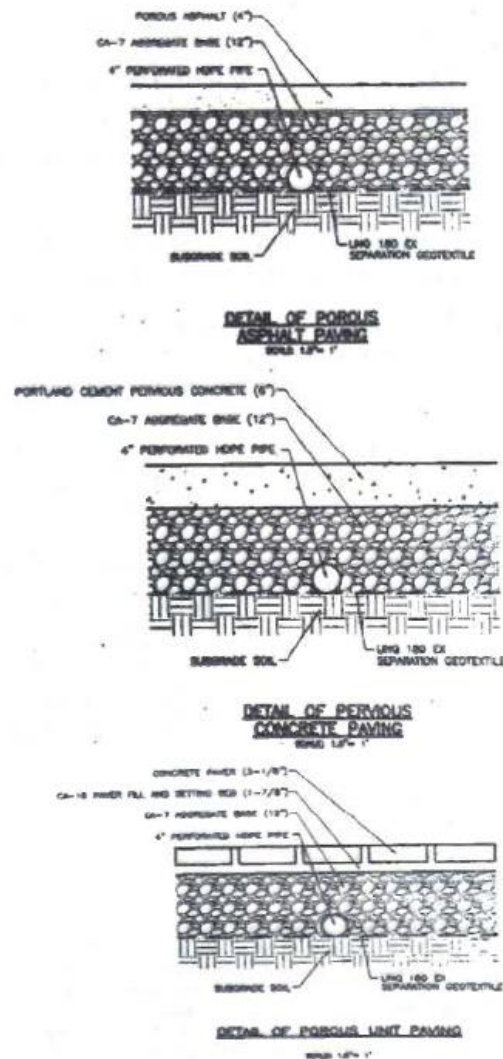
Design details of the permeable pavers, permeable concrete and permeable asphalt lots of the parking lot at the Stickney Water Reclamation Plant.
